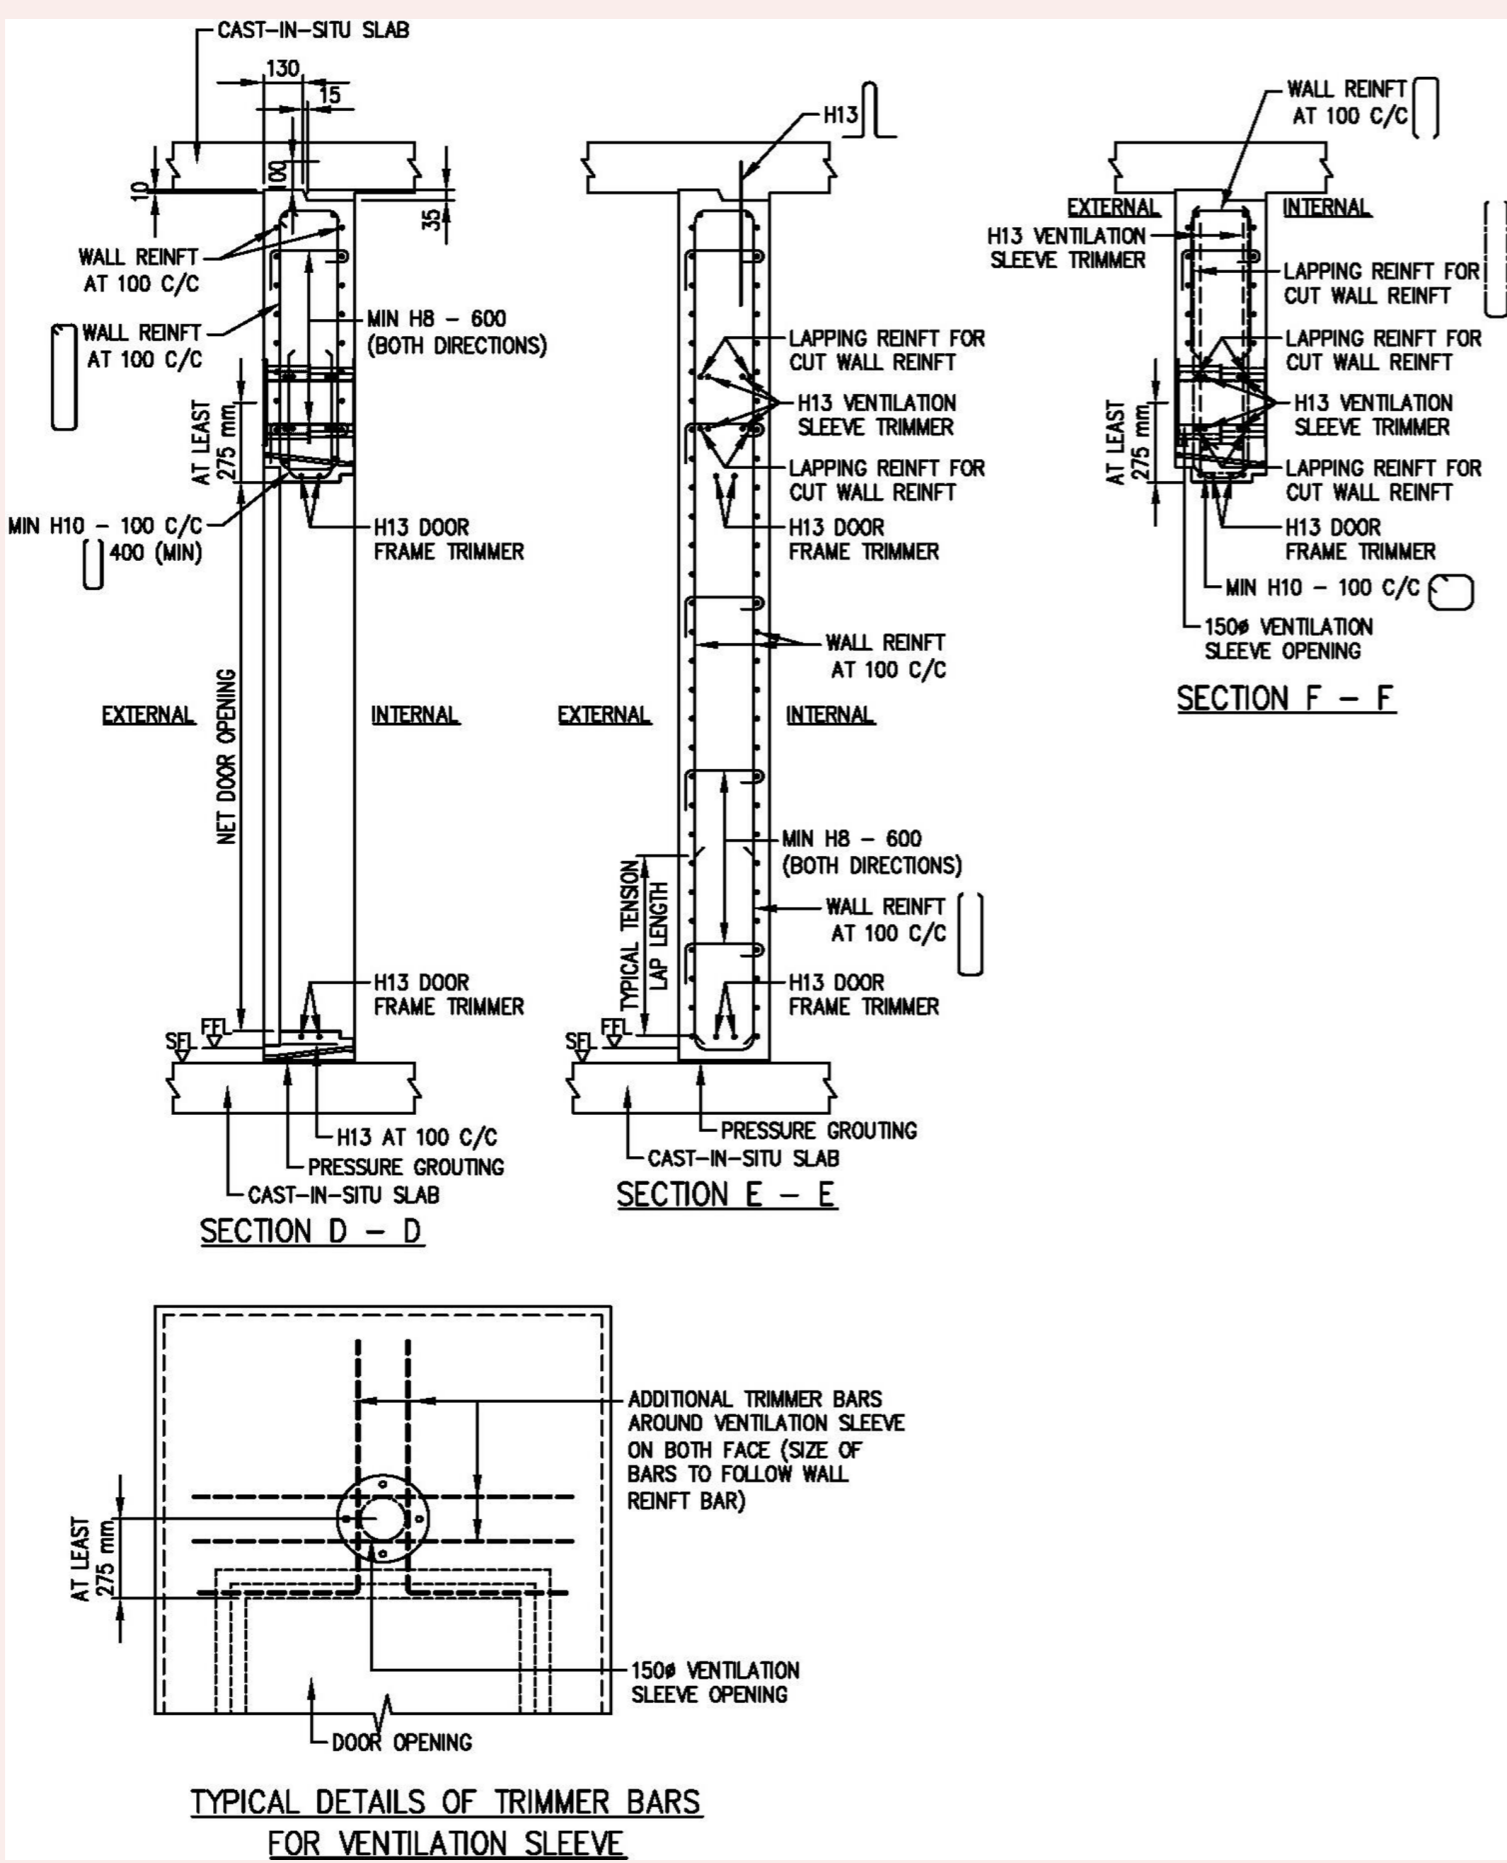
(d): DETAILS AND SECTIONS OF PRECAST SS DOOR FRAME WITH VENTILATION SLEEVE ALONG ITS SIDE (TYPE 1)
